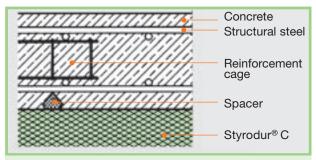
Accessible spacer made from fiber reinforced concrete for the bottom reinforcement, and reinforcement cage made from wire fabric for the upper reinforcement of the foundation slab.
